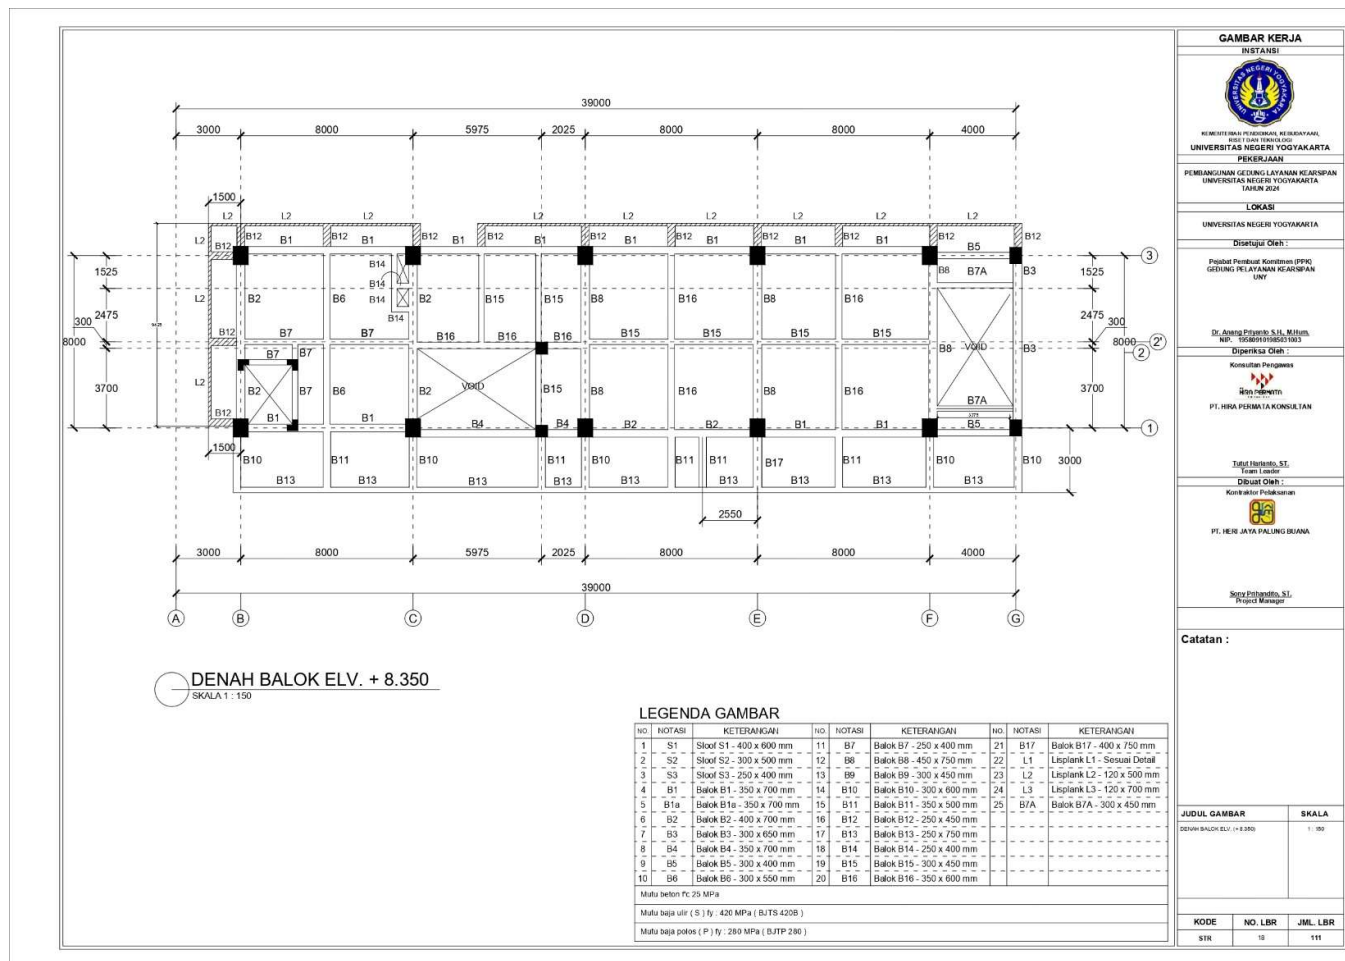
7 Beam Site Plan of Elv. +8.350
